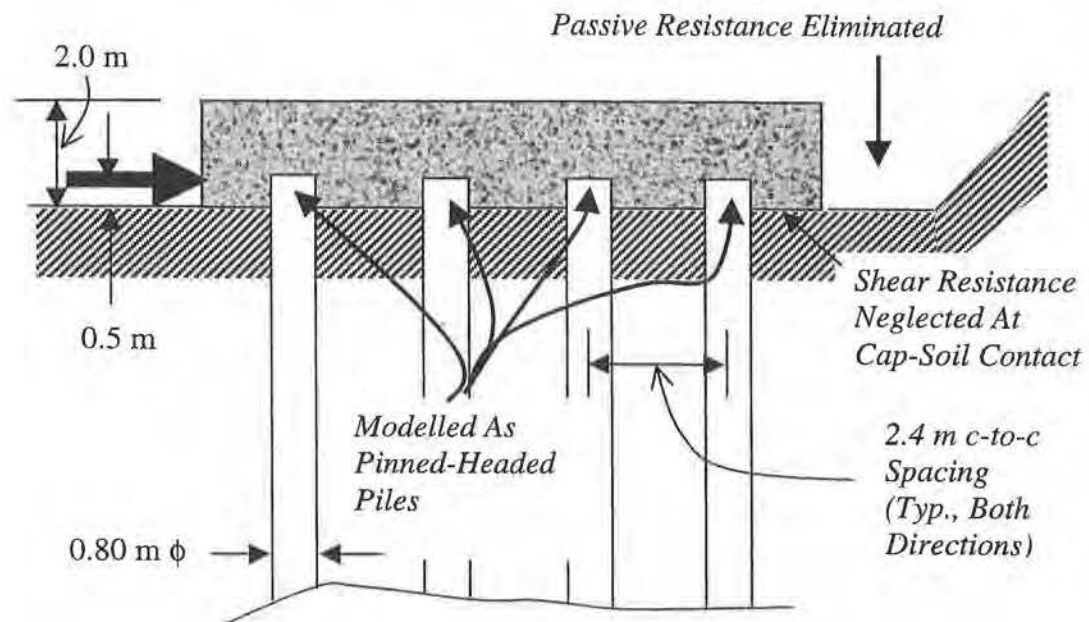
FLPIER Modelling Arrangement for Driven Pile Group
